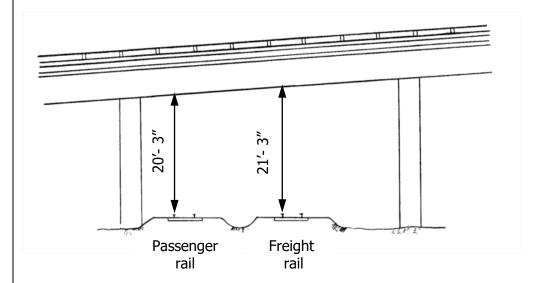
Bridge elevation view with one passenger rail and one freight rail track below the bridge.
